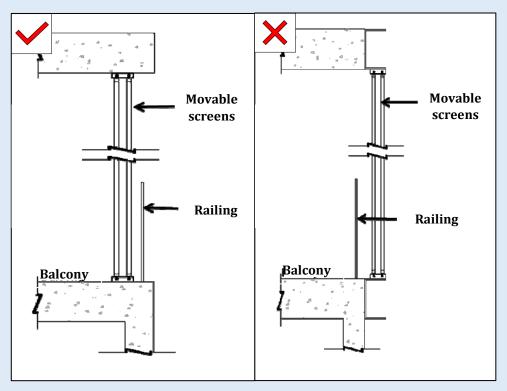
I: Exterior Movable Balcony Screens should be on interior of building/parapet wall
